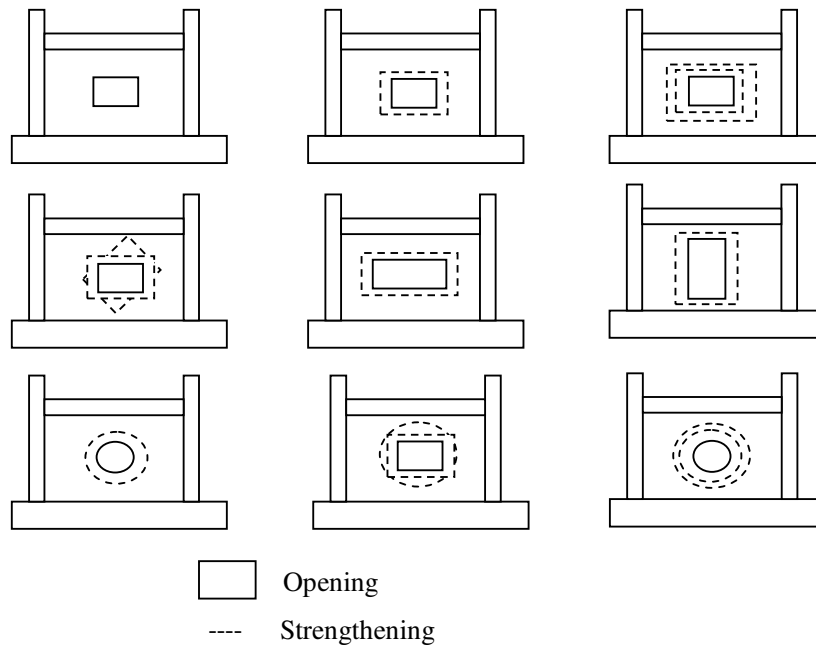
Shear wall with openings (Lin and Kuo, 1988)
